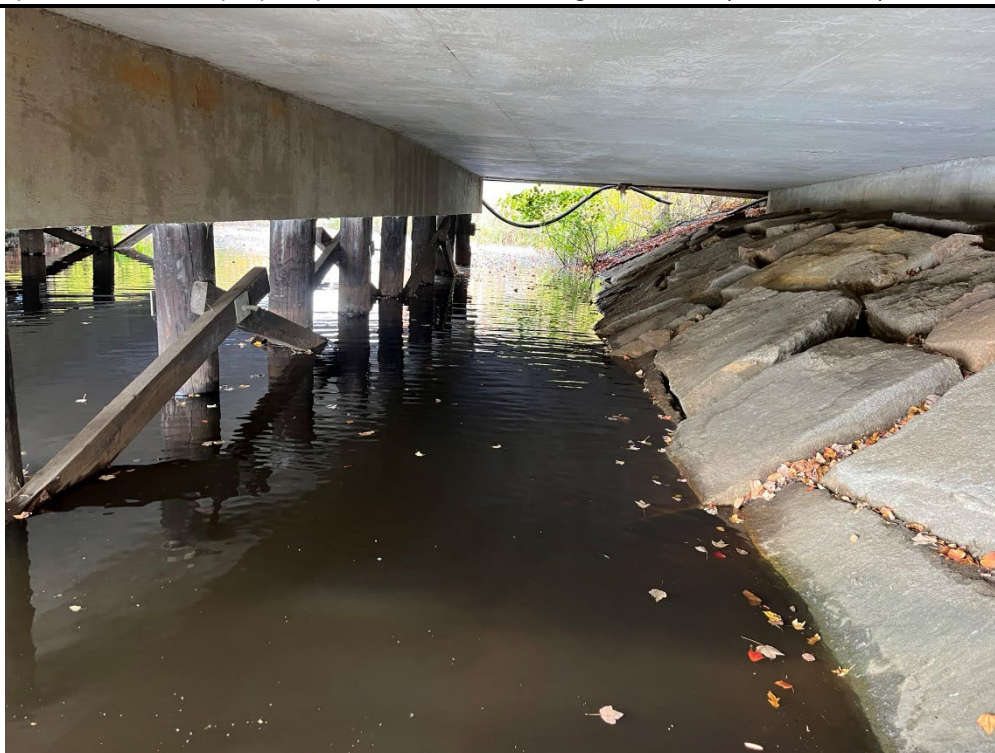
Status of piers and north riprap slope. Photo taken facing southwest (downstream).
